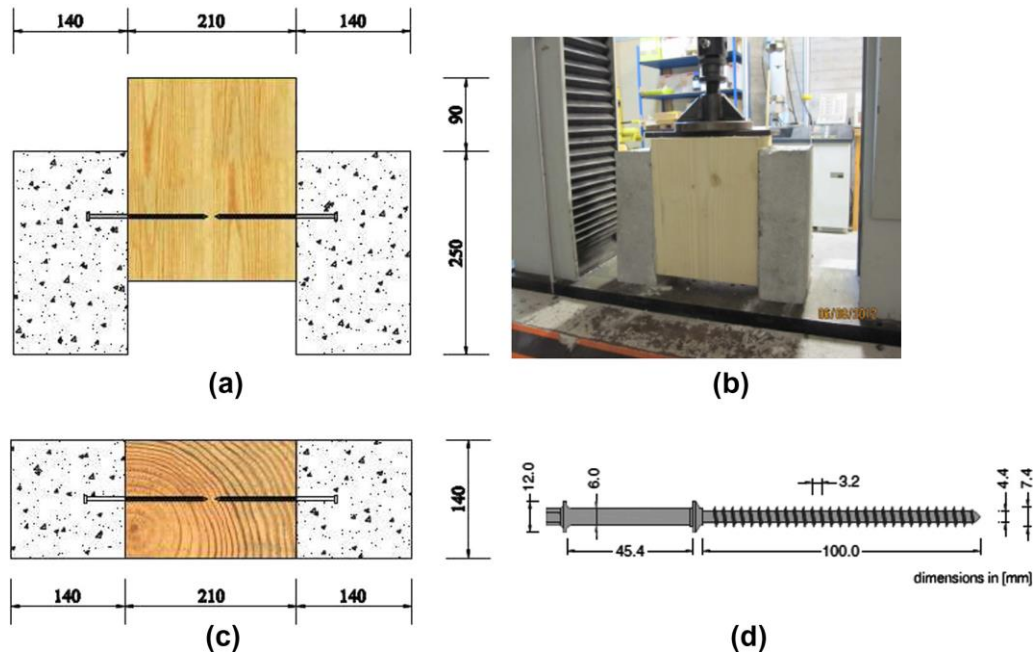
Push-out shear test on TCC specimens: (a) specimen geometry, (b) test set-up, (c) top view, and (d) SFS-screw VB 48 7.5 100, Oudjene et al. [56]
